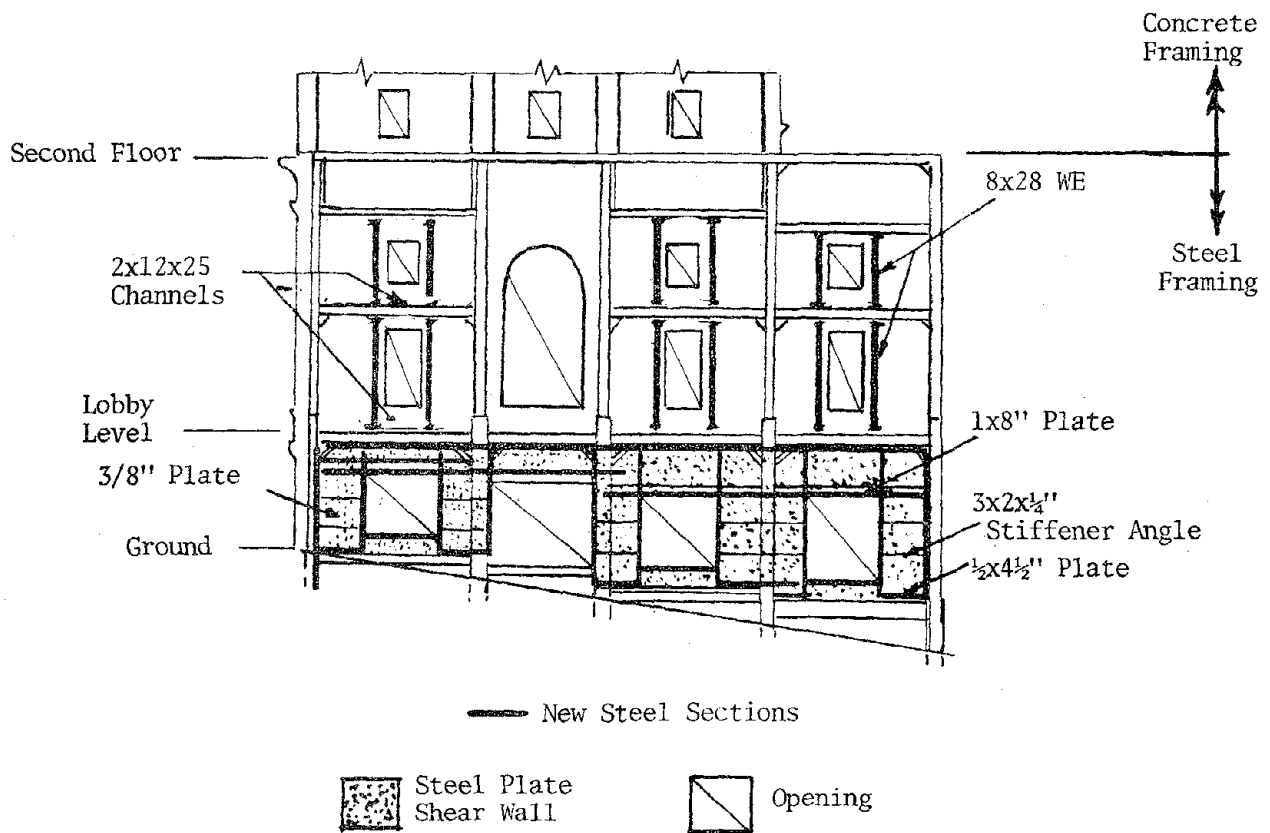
(a) STRUCTURAL STEEL SHEAR WALL AND FRAMING REINFORCEMENT AT BOTTOM OF NORTH END OF EAST WING
